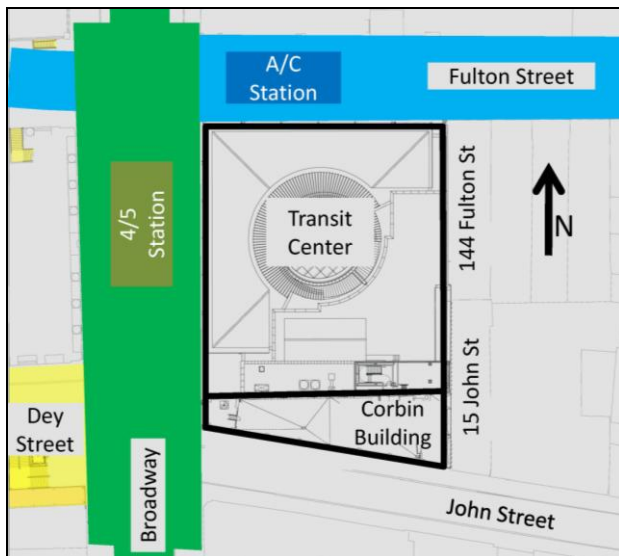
Plan view of the site showing the locations of the adjacent subway stations.
